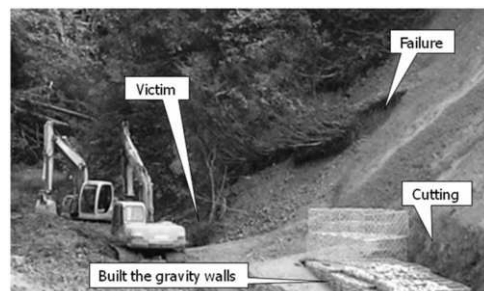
Labor accident caused by slope failure at a construction site
